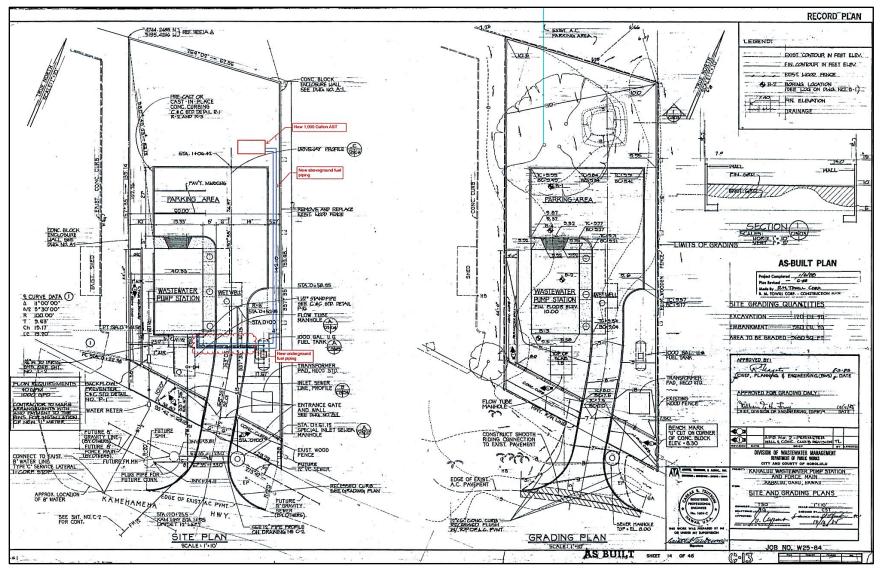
"As Built" plans for the Kahaluu WWPS ("Project Completed 1/6/88") showing locations of the new 1,000-gallon AST, new above-ground fuel piping, and new underground fuel piping (Okahara and Associates, Inc.; courtesy of client)
